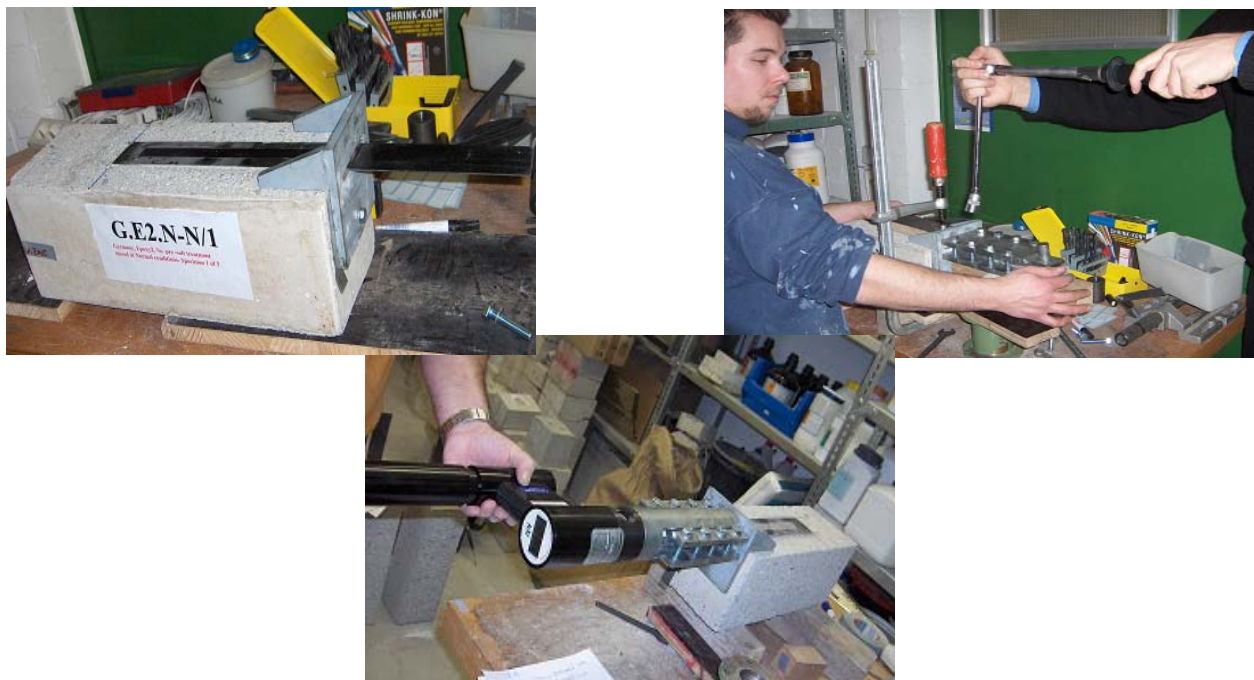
Testing process for measuring CFRP plate-concrete bond strength
